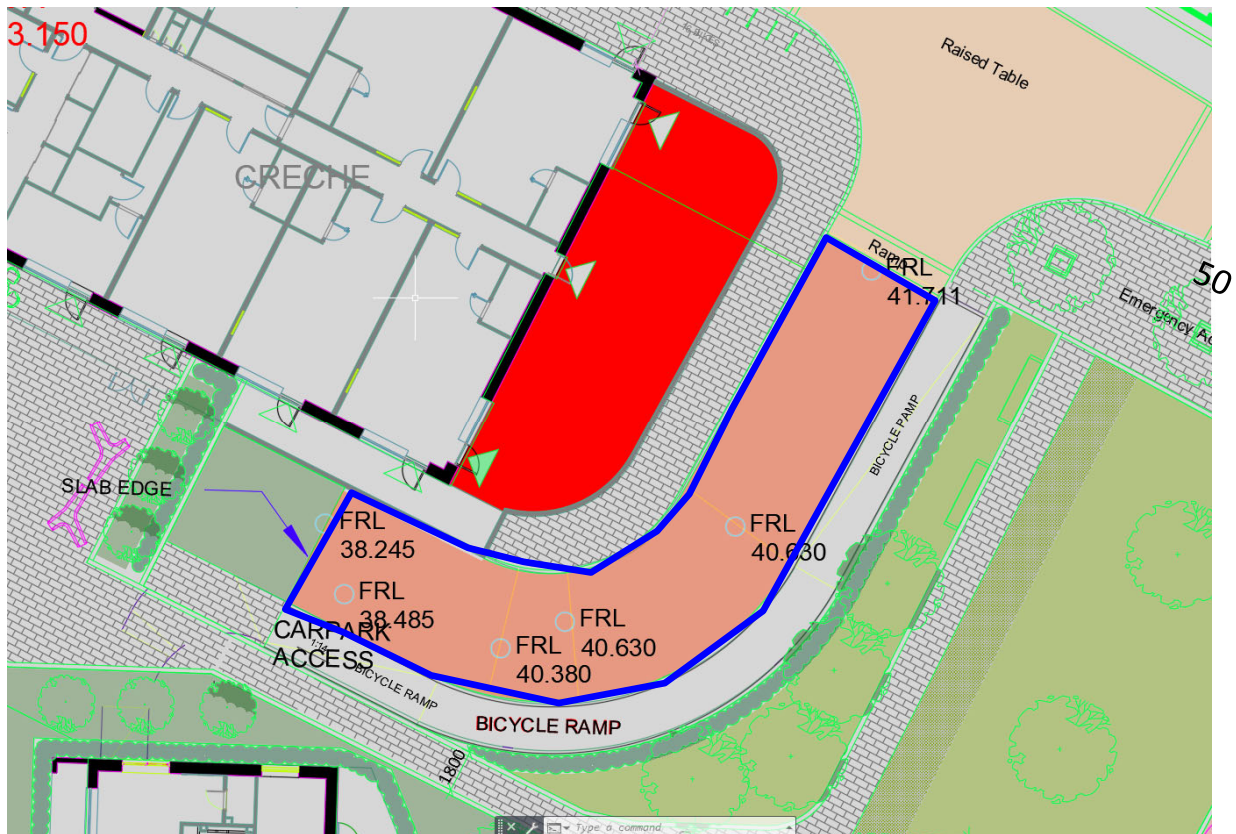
Plan View of location of proposed basement access ramp (outlined in blue)
